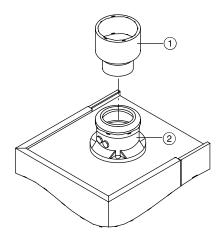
Installing single-wall vent pipe adaptor Vitodens 100-W WB1B 10-26/35 and 200-W WB2B 9-19/26/35
